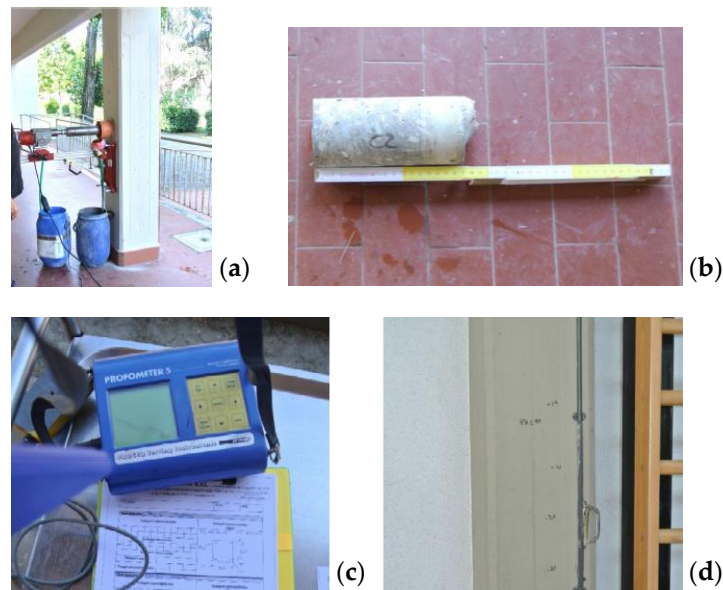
Tests on the R/C members: placement of the core drill on a ground storey column (a); a concrete core after extraction (b); a pacometer used in the tests (c); resulting bar and stirrup positions traced out on a column (d).
